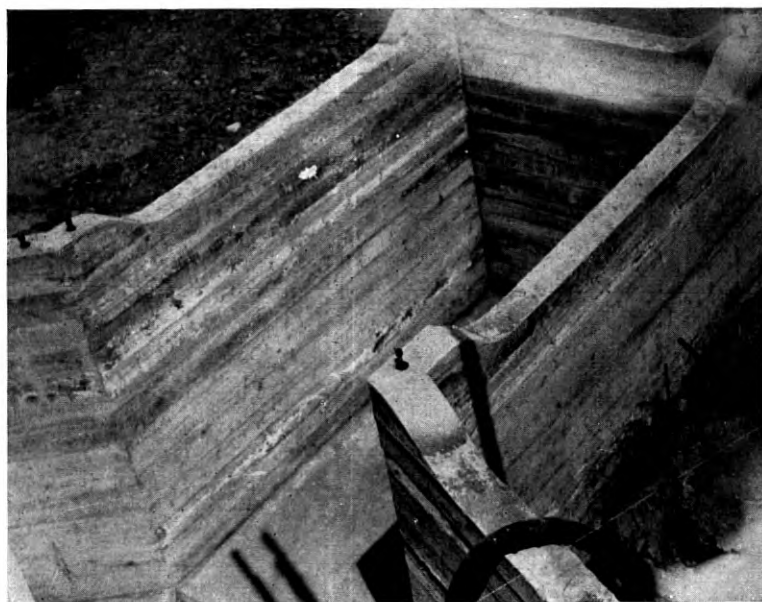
Concrete Foundation and Protecting Walls for Treating Tanks
